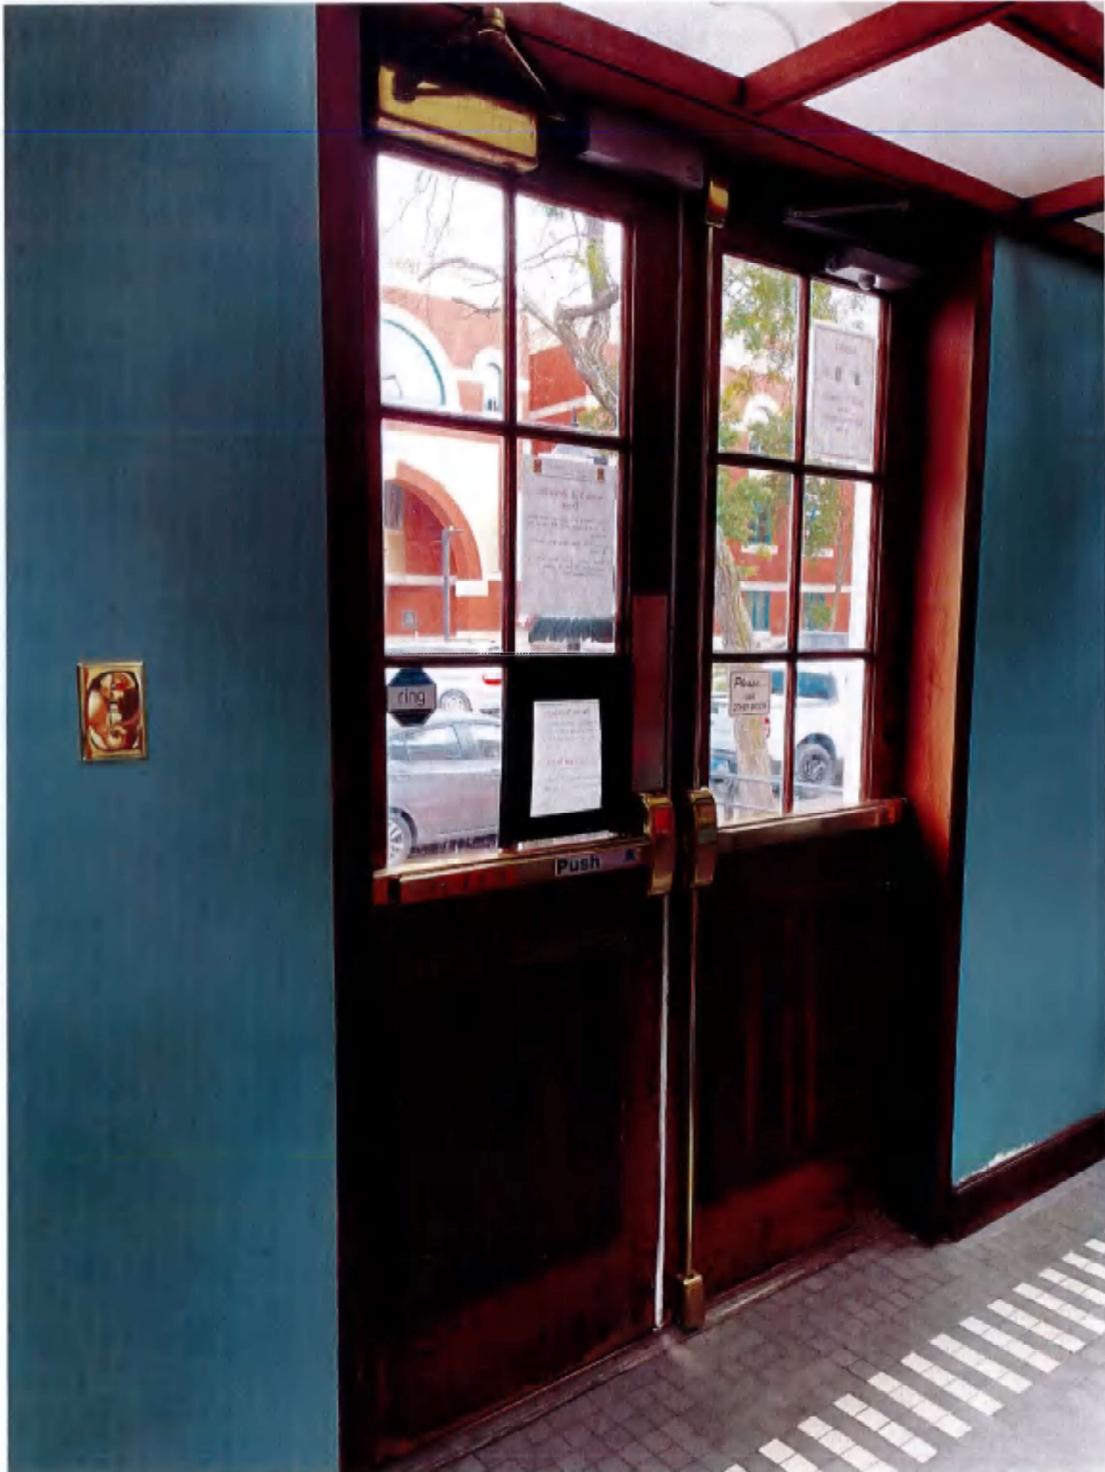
Sikh Worship Center, front (west) elevation, center door interior, June 23, 2025.
